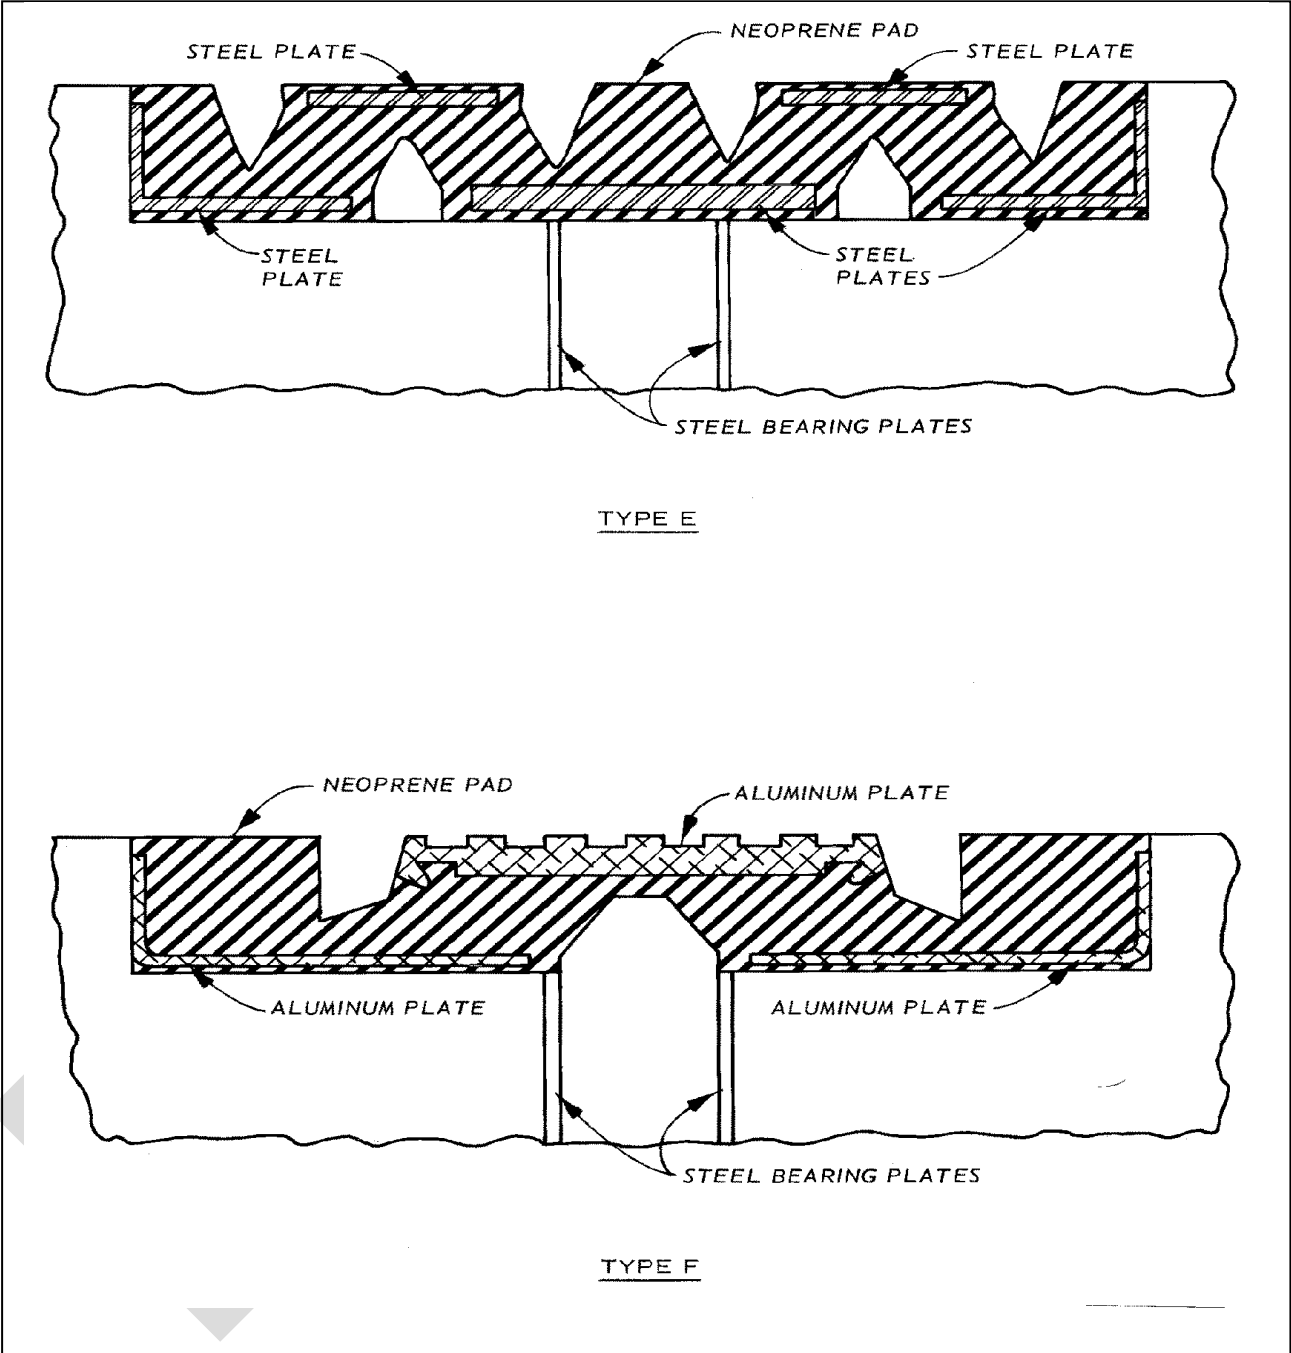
Typical Transverse Joint Seals (Sheet 3 of 3)
